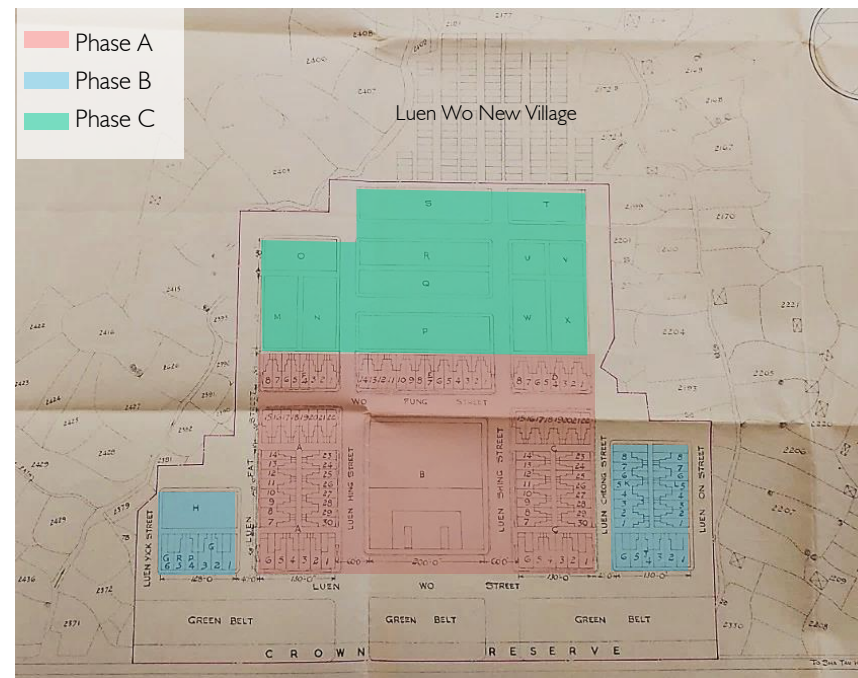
Modified plan showing the 3-phases construction, 1961.<sup>143</sup>
